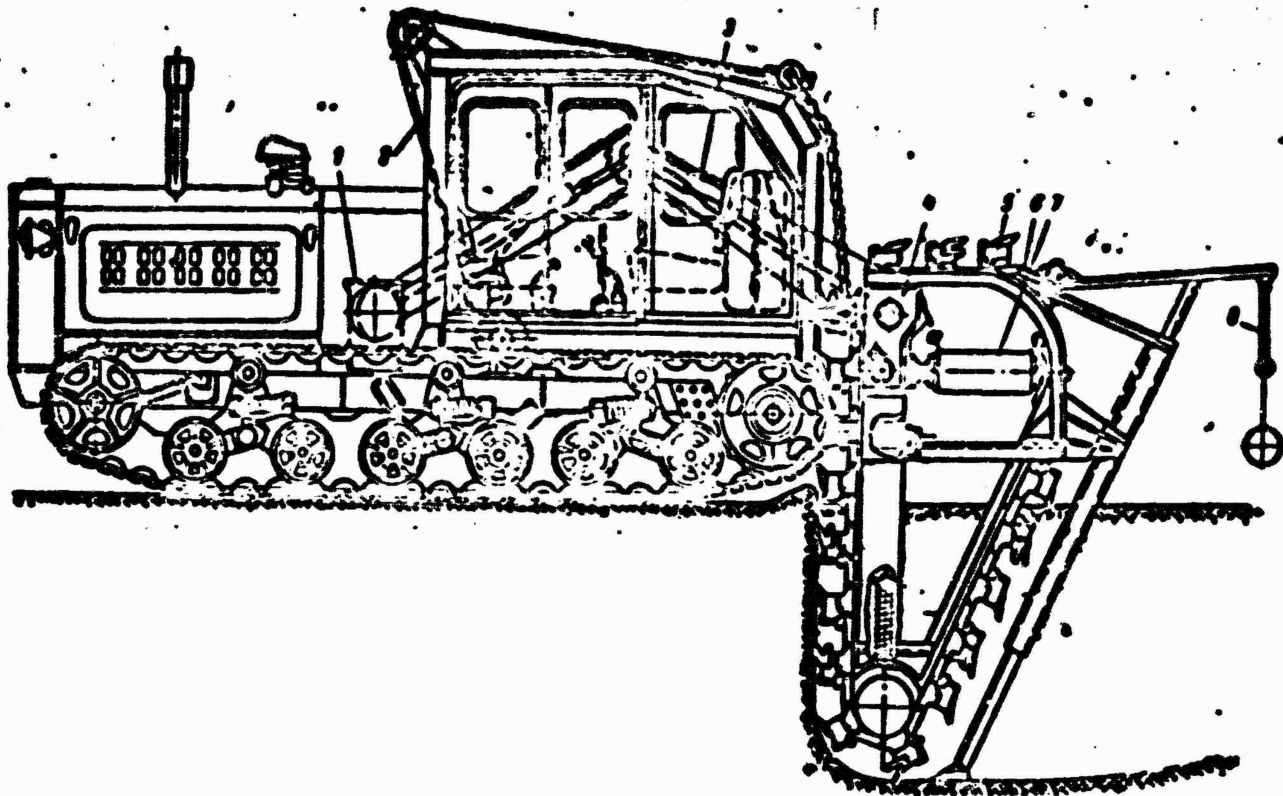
The ETN-141 trench excavator. 1) Intermediate reducing unit; 2) mechanism for raising and lowering the working equipment; 3) chain drive for the working equipment; 4) drive mechanisms; 5) bucket; 6) bucket chain; 7) conveyer belt; 8) inclinometer.
